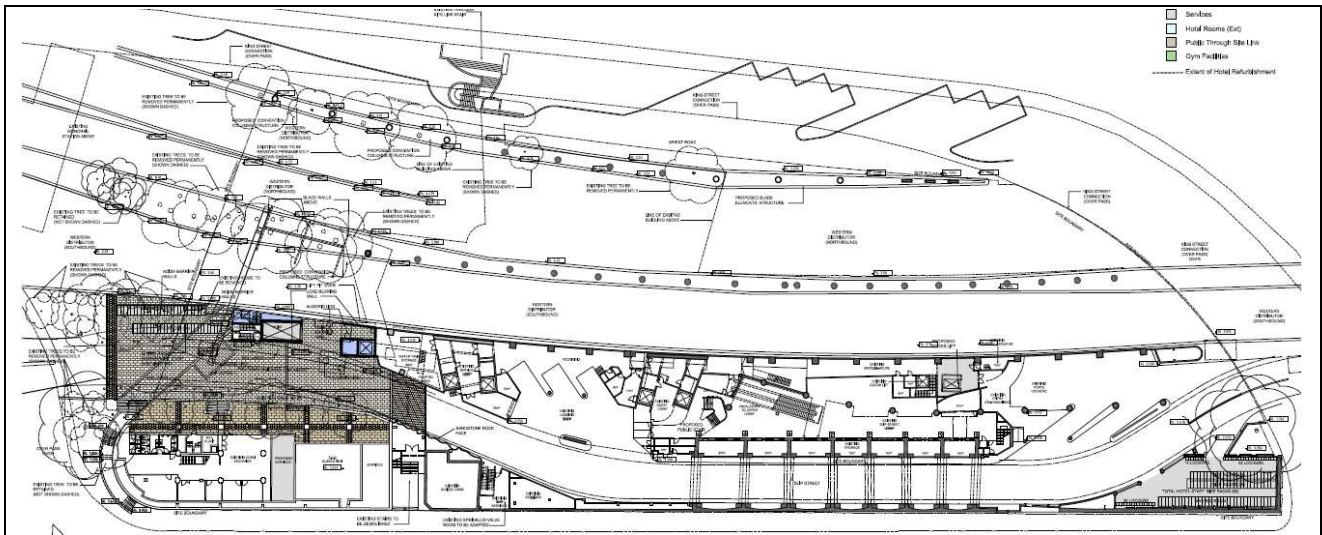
Approved structural columns, trusses and footings design under the convention/function space and retention of trees (Lower Ground Level)
